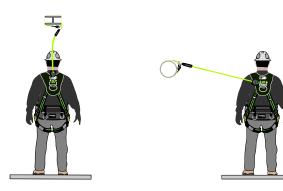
TIE-BACK CONNECTION TO ANCHOR POINT
